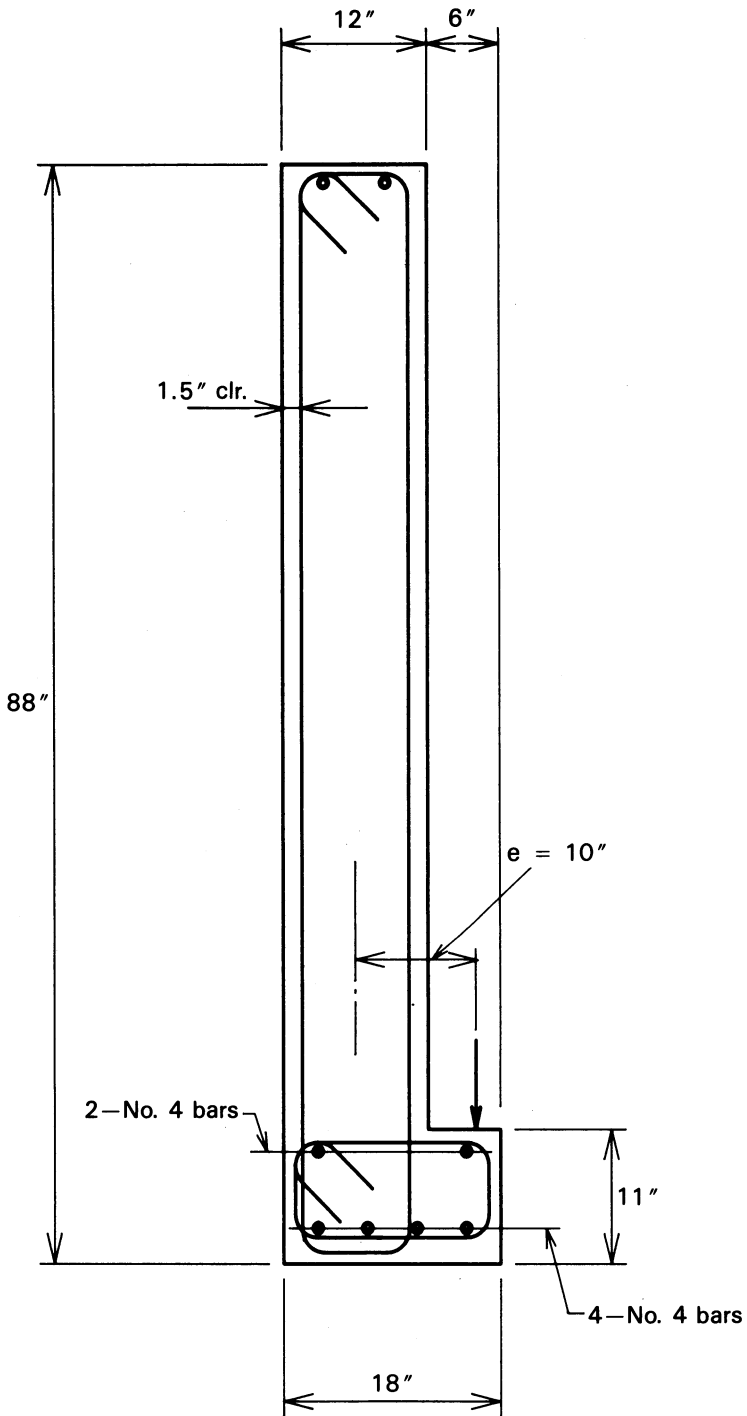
Cross section of the spandrel beam for I.P. 6-6.
